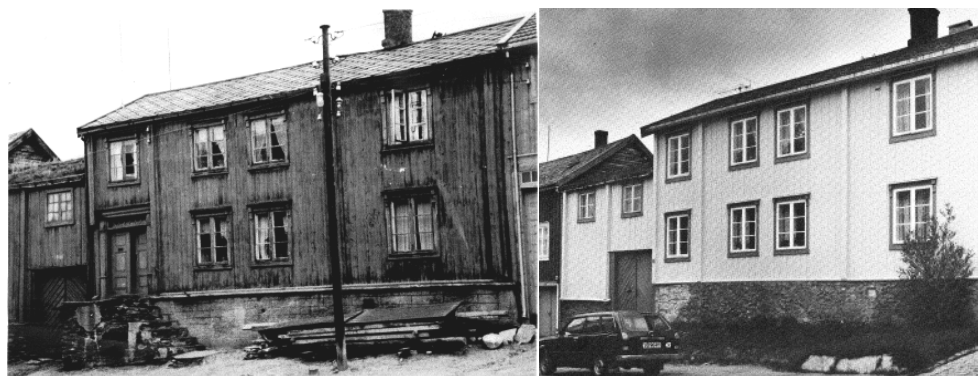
Kjerkgata 54 circa 1953, photograph provided by the owner in 1953, from the Røros municipality case file. In 1954 the building's cladding and windows were replaced, the street entrance closed off and the steps removed, and the foundation wall repaired with the application of a different type of rendering. Right: Kjerkgata 54 in the early 1980s as it was presented in *Riksantikvaren's Fredede hus og anlegg. Røros*. (Photograph Ukjent, Røros municipal building archive; Anne Wintherthun ©Riksantikvaren)
